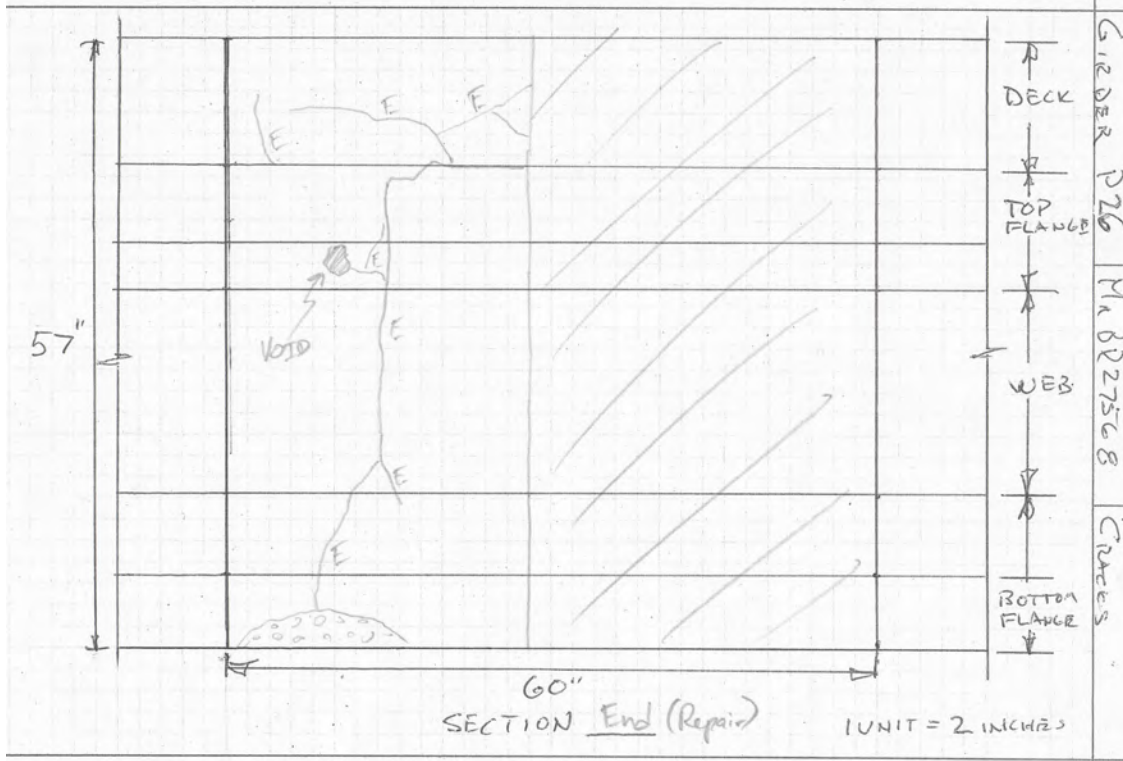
Girder P26 crack pattern – repair end view
